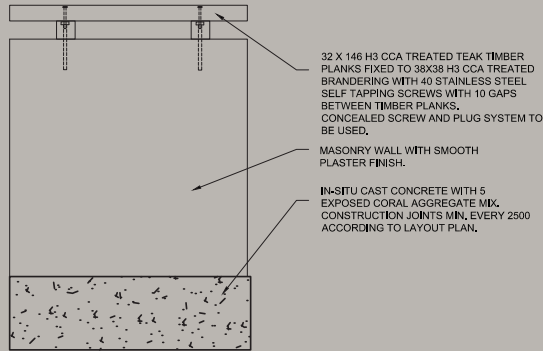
Detail Section Elevation (1:10) of Bench (Author, 2014).
